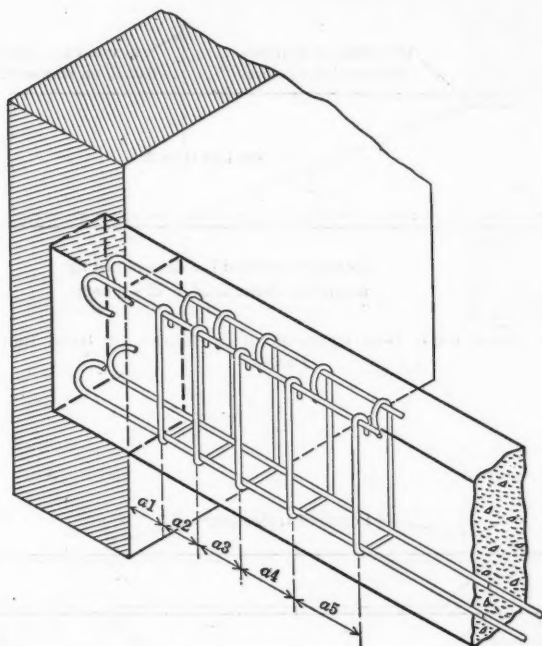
TYPICAL REINFORCED CONCRETE BEAM WITH ANCHORED LONGITUDINAL BARS AND VERTICAL STIRRUPS.
